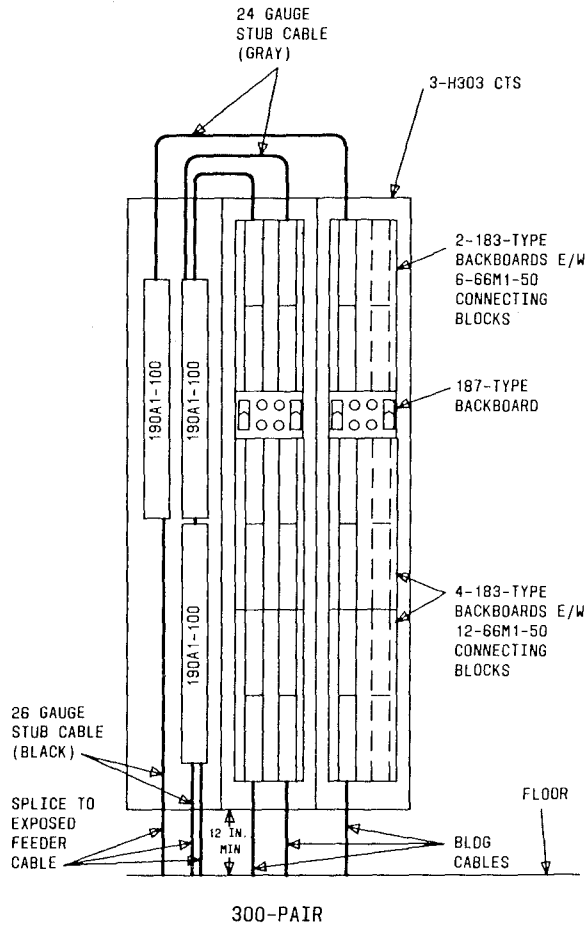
300- and 400-Pair Exposed Entrance Cable—66-Type Connecting Block
